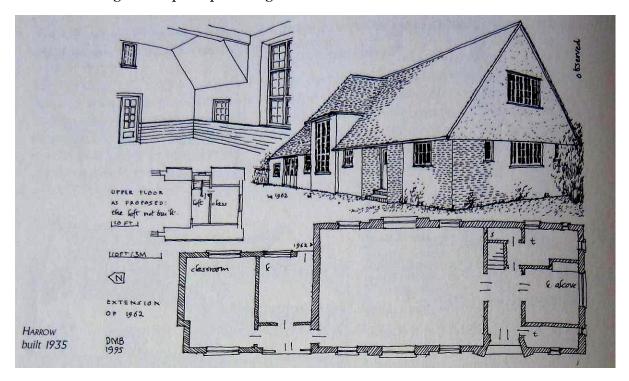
Ground floor plan, internal and external views (from Butler Vol. 1, p.404)
